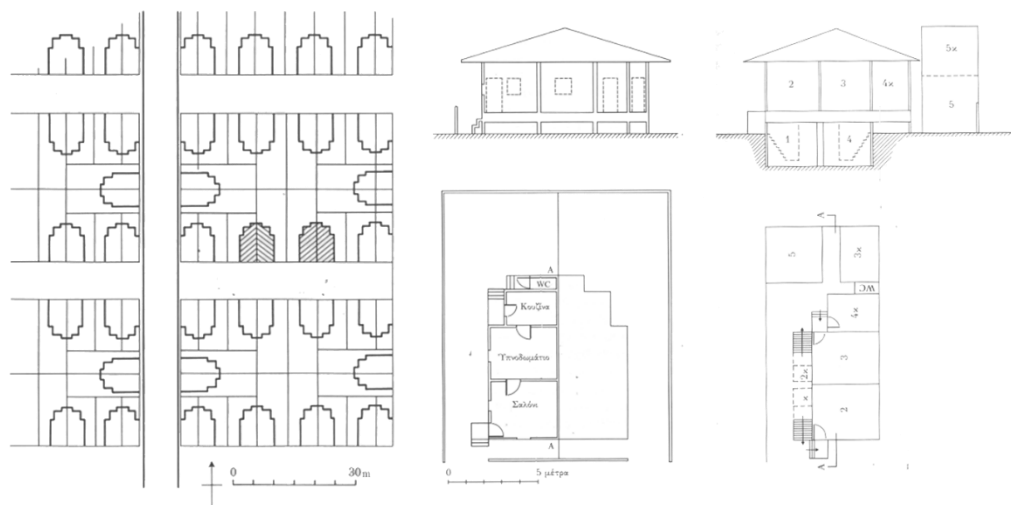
Right: diagram of the initial plan showing the main street (vertical) and secondary streets (horizontal) and the subdivision of the shacks into two units. Middle: Section and floor plan of a shack as designed in 1926. Left: expansion to the basement and on the patio as Hirschon observed in 1972
